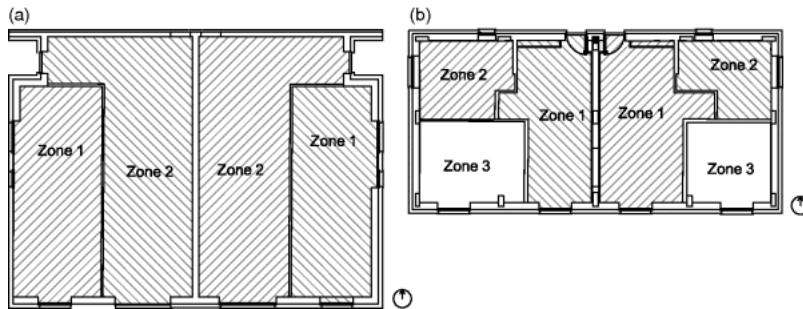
(a) The thermal zones of the ground, first floor and (b) second floor
